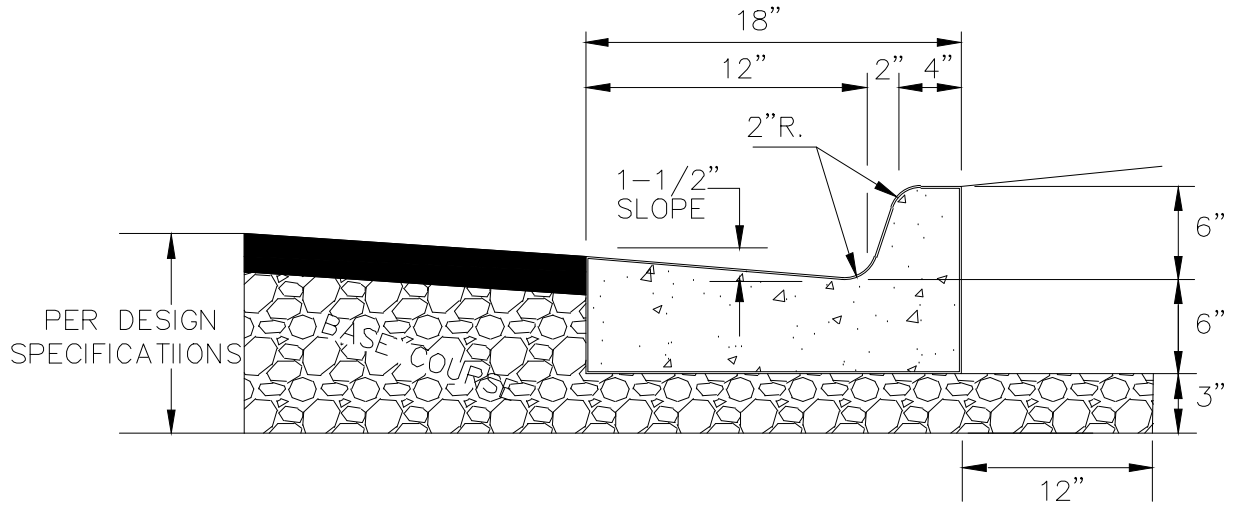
HEAVY DUTY CONCRETE SECTION
